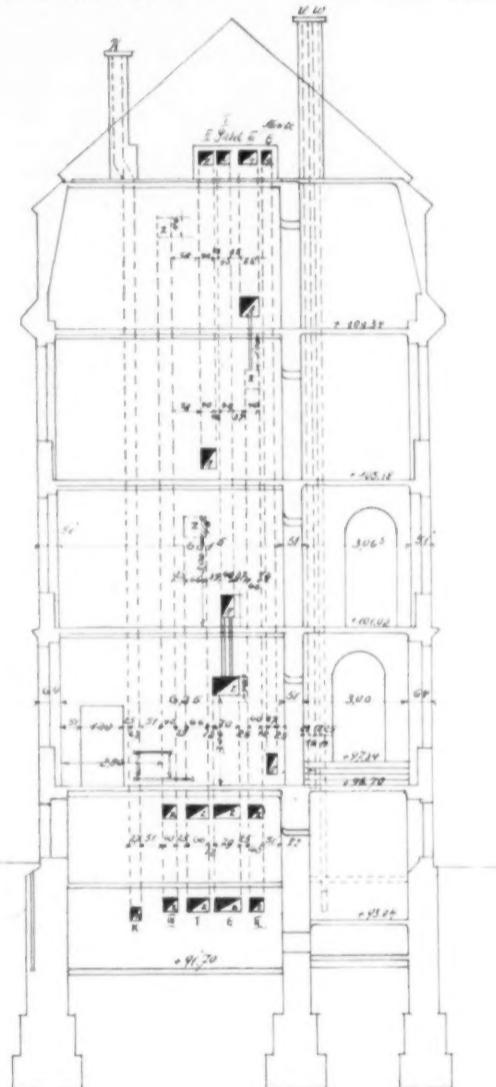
SECTIONAL PLAN SHOWING THE PLACING OF THE VERTICAL AIR DUCTS TOGETHER WITH THE CLASSROOM VENTS AND EXHAUST OPENINGS IN THE ATTIC.
